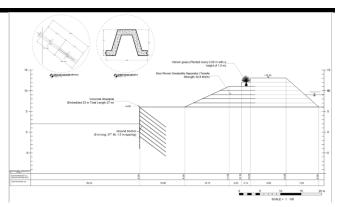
Geometry of alternative slope reinforcement using Sheet Pile
